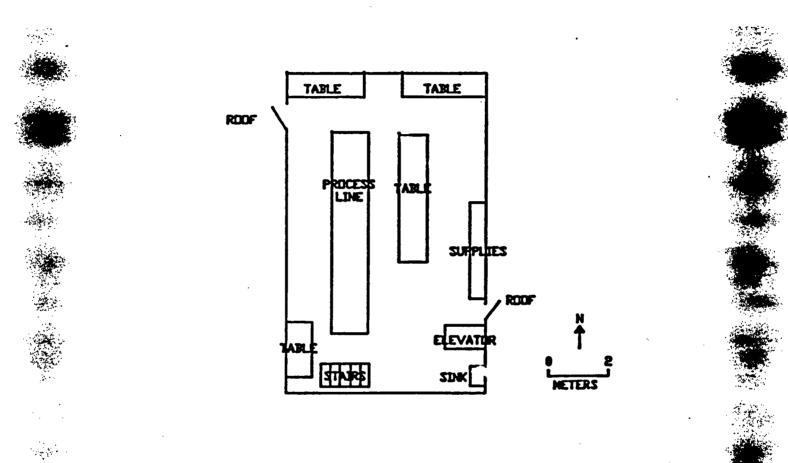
Floor Plan of the Sunflame Appliances Facility Penthouse.
